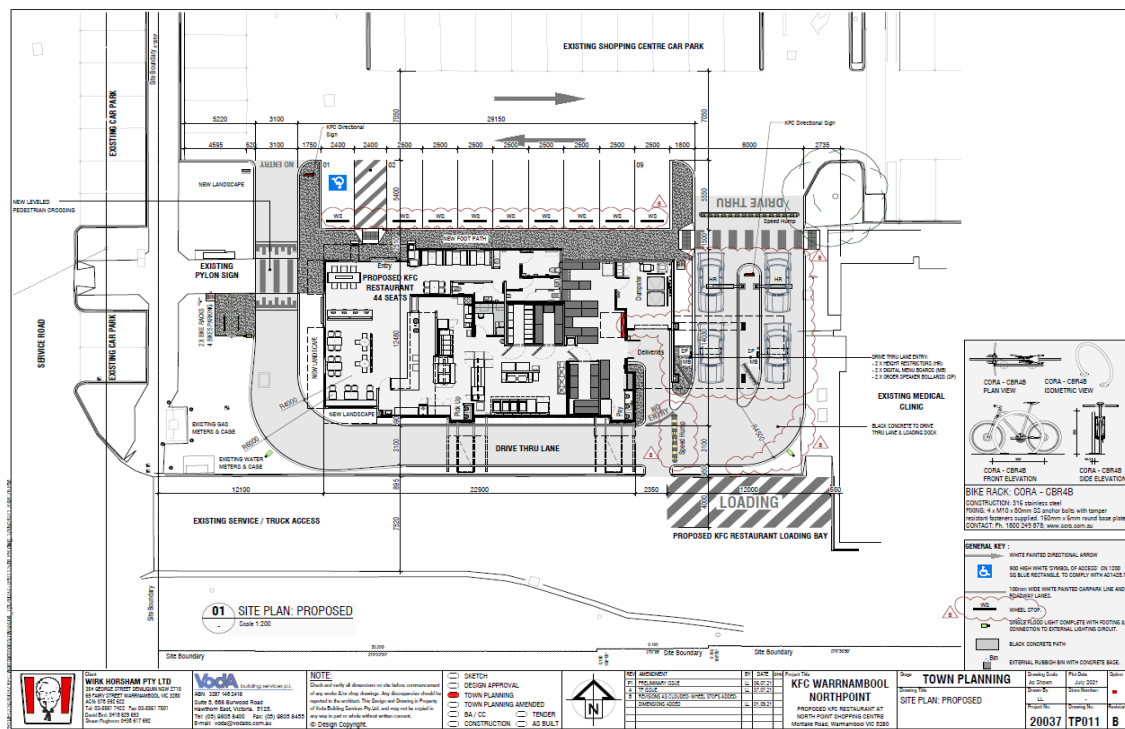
Proposed floor plan (Source: Plan submitted by the applicant)
